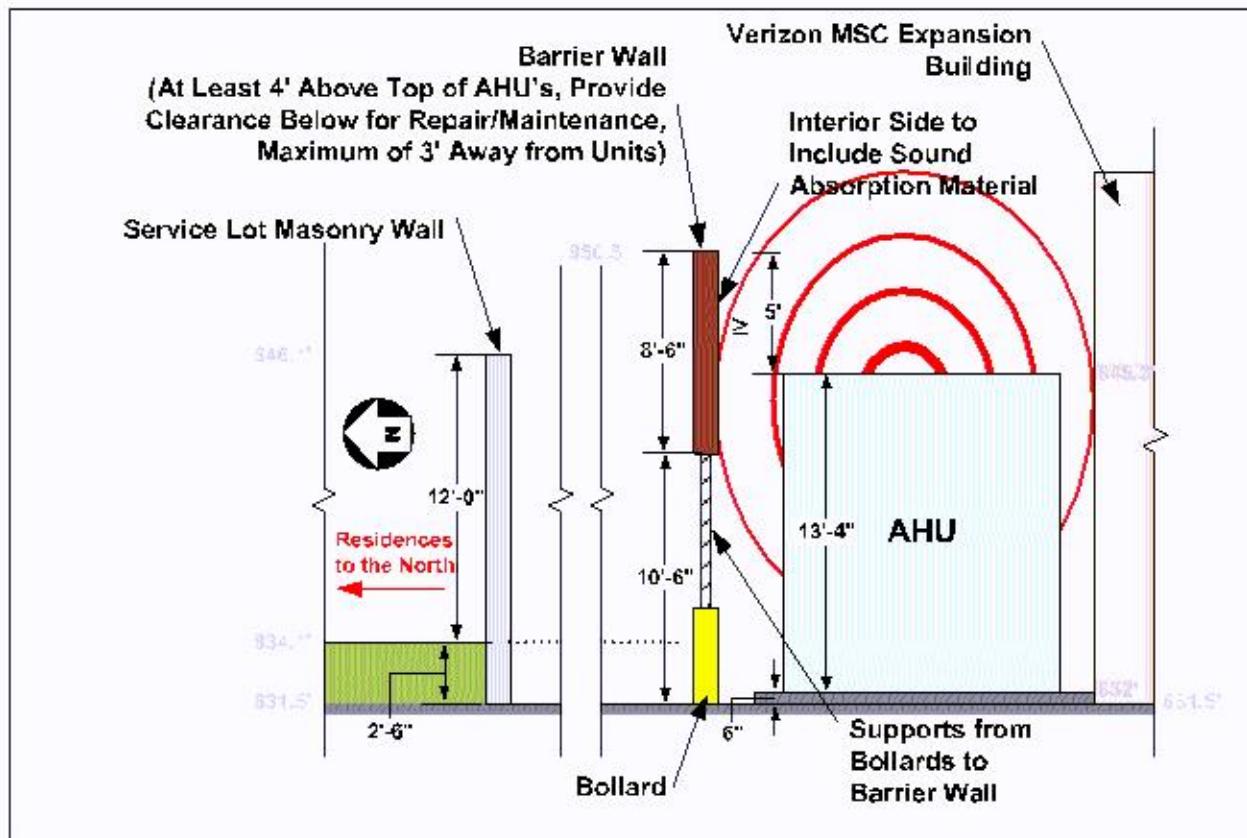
Elevation sketch of the proposed AHU noise control barrier wall.
